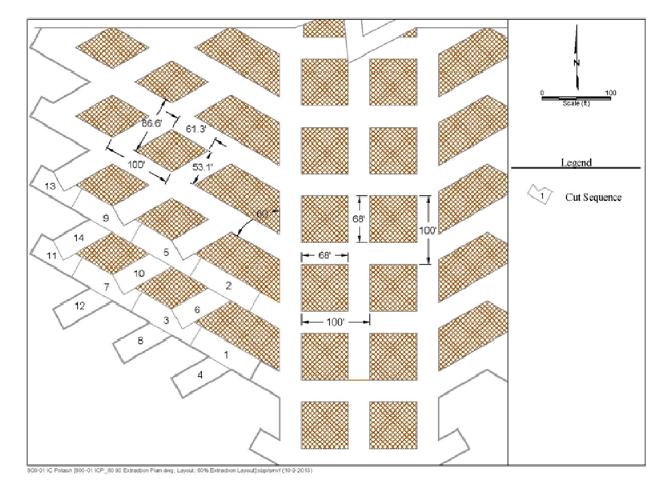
Pillar Dimensions for 60% Extraction Plan
